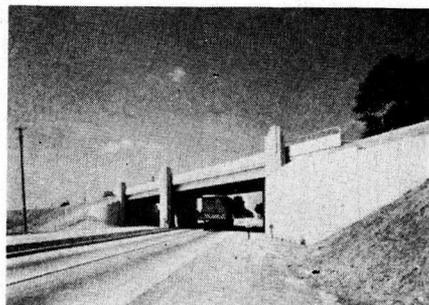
Curved Concrete Wing Walls. Courtesy of Portland Cement Assn.
